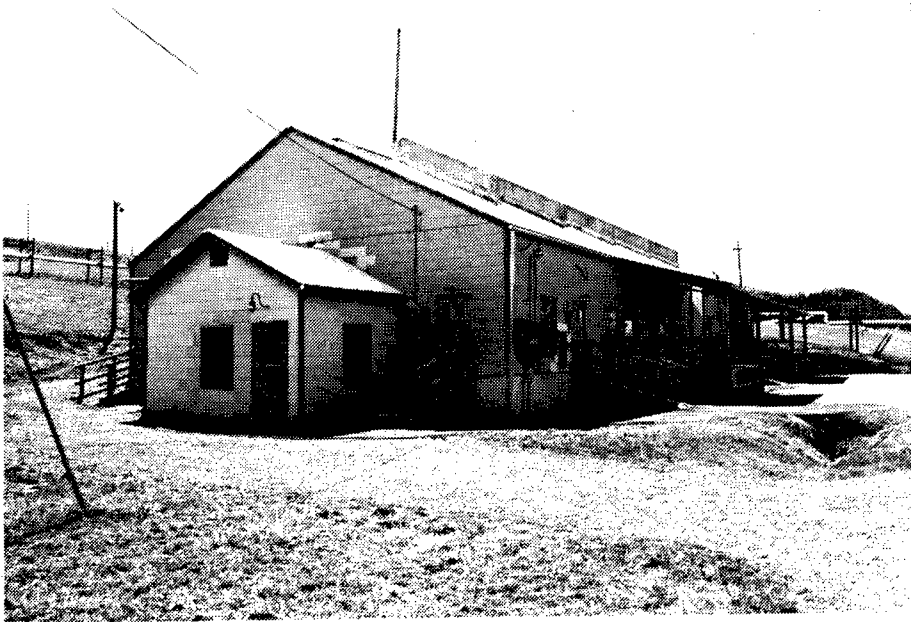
Building 4924-6: Machine and Saw House with cinder block fire breaks not extending beyond the regular walls.
